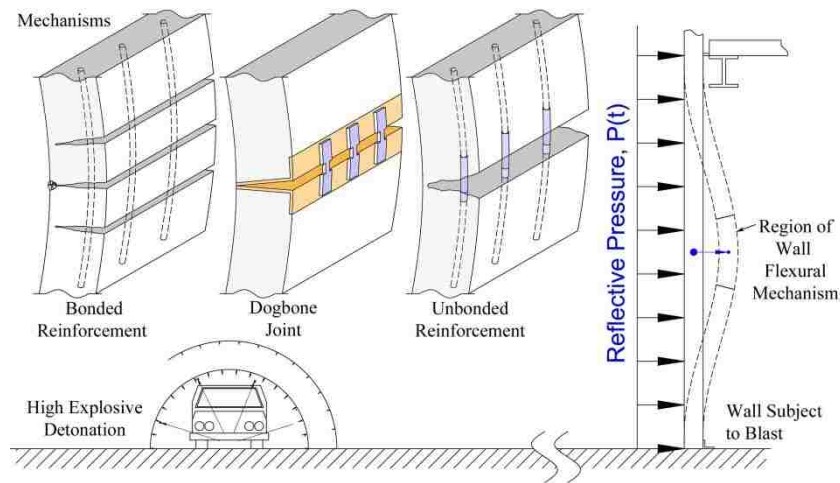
Flexural mechanisms in thin reinforced concrete panels
